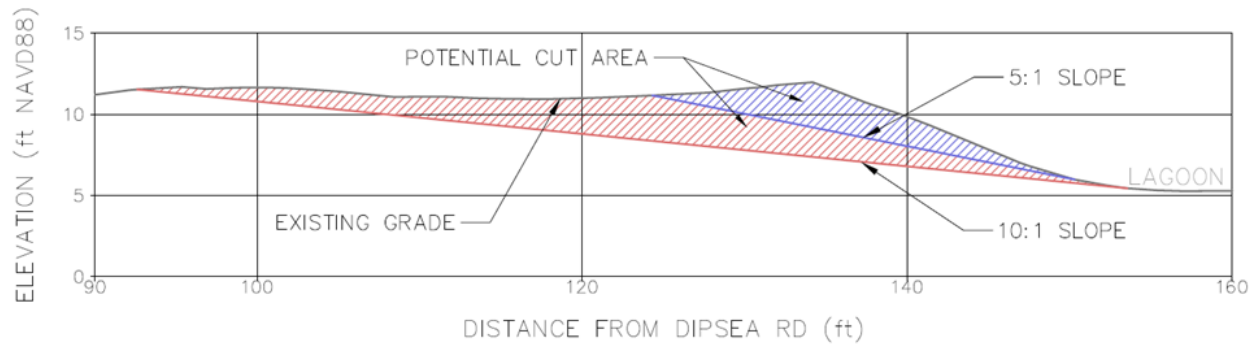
Typical cross-section of the setback shoreline for a 5:1 and 10:1 slope
